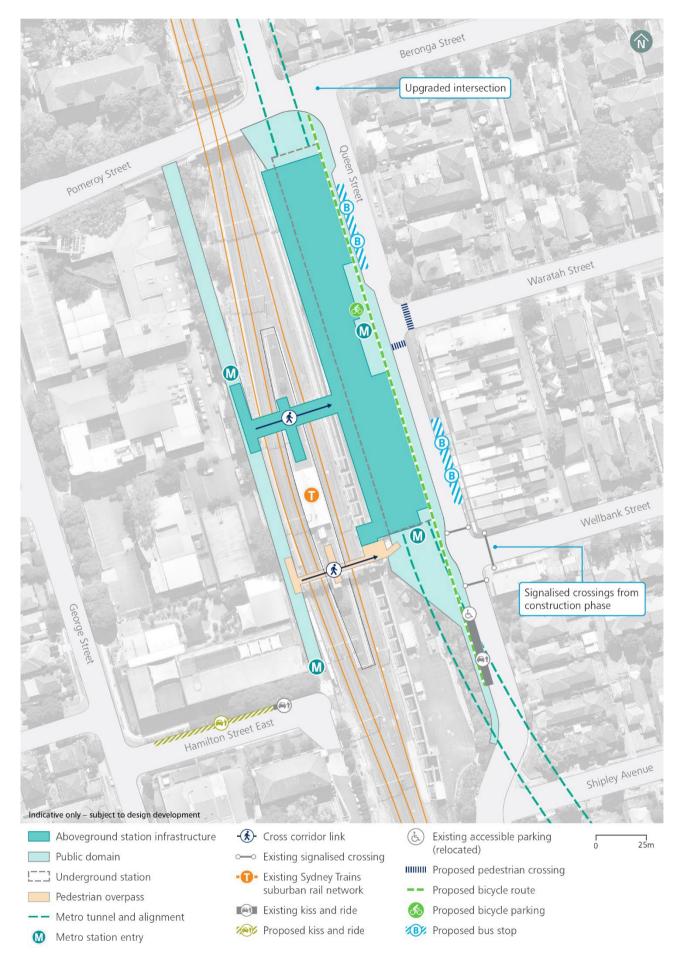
Indicative layout and key design elements - North Strathfield metro station
